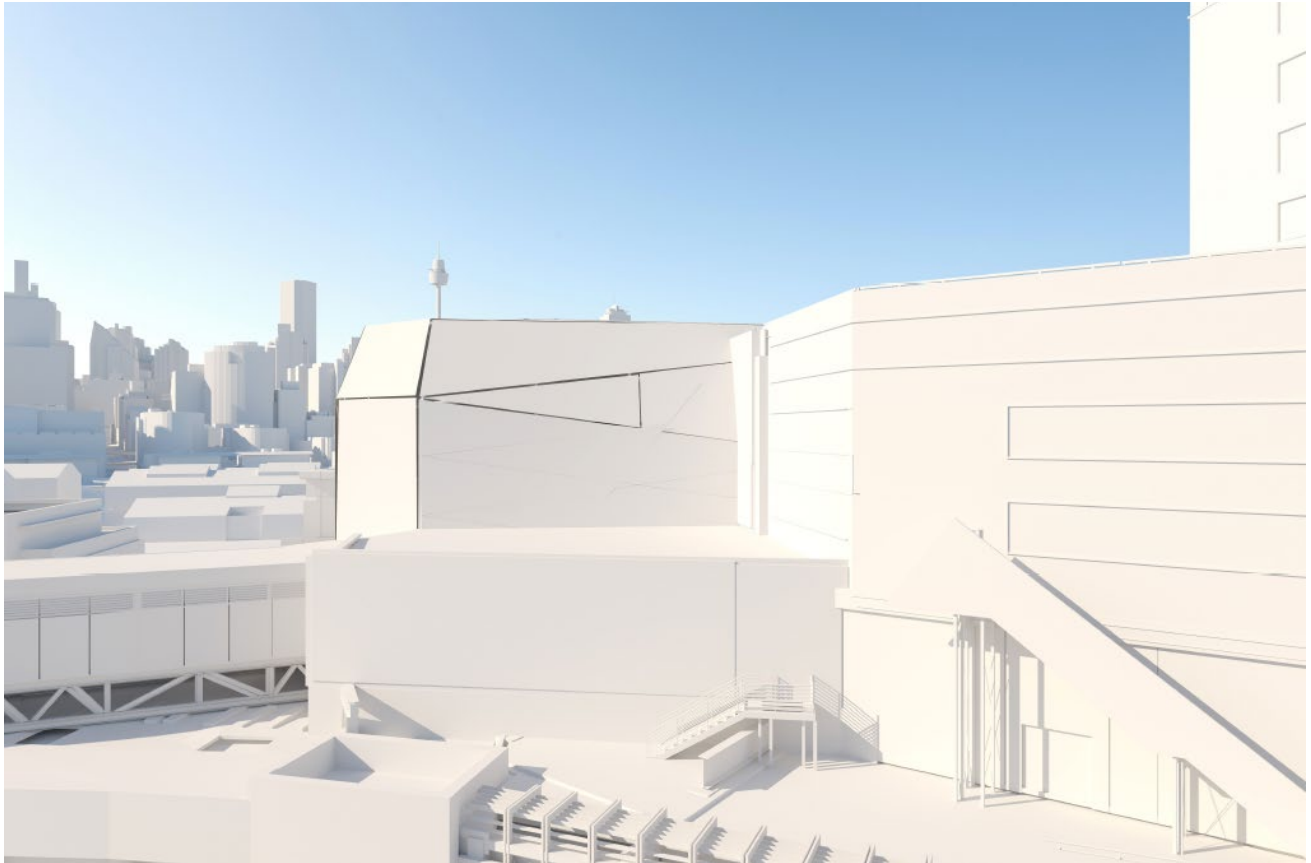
CAM04: Watermark Tower, south elevation, level 7 (8th storey), existing view
